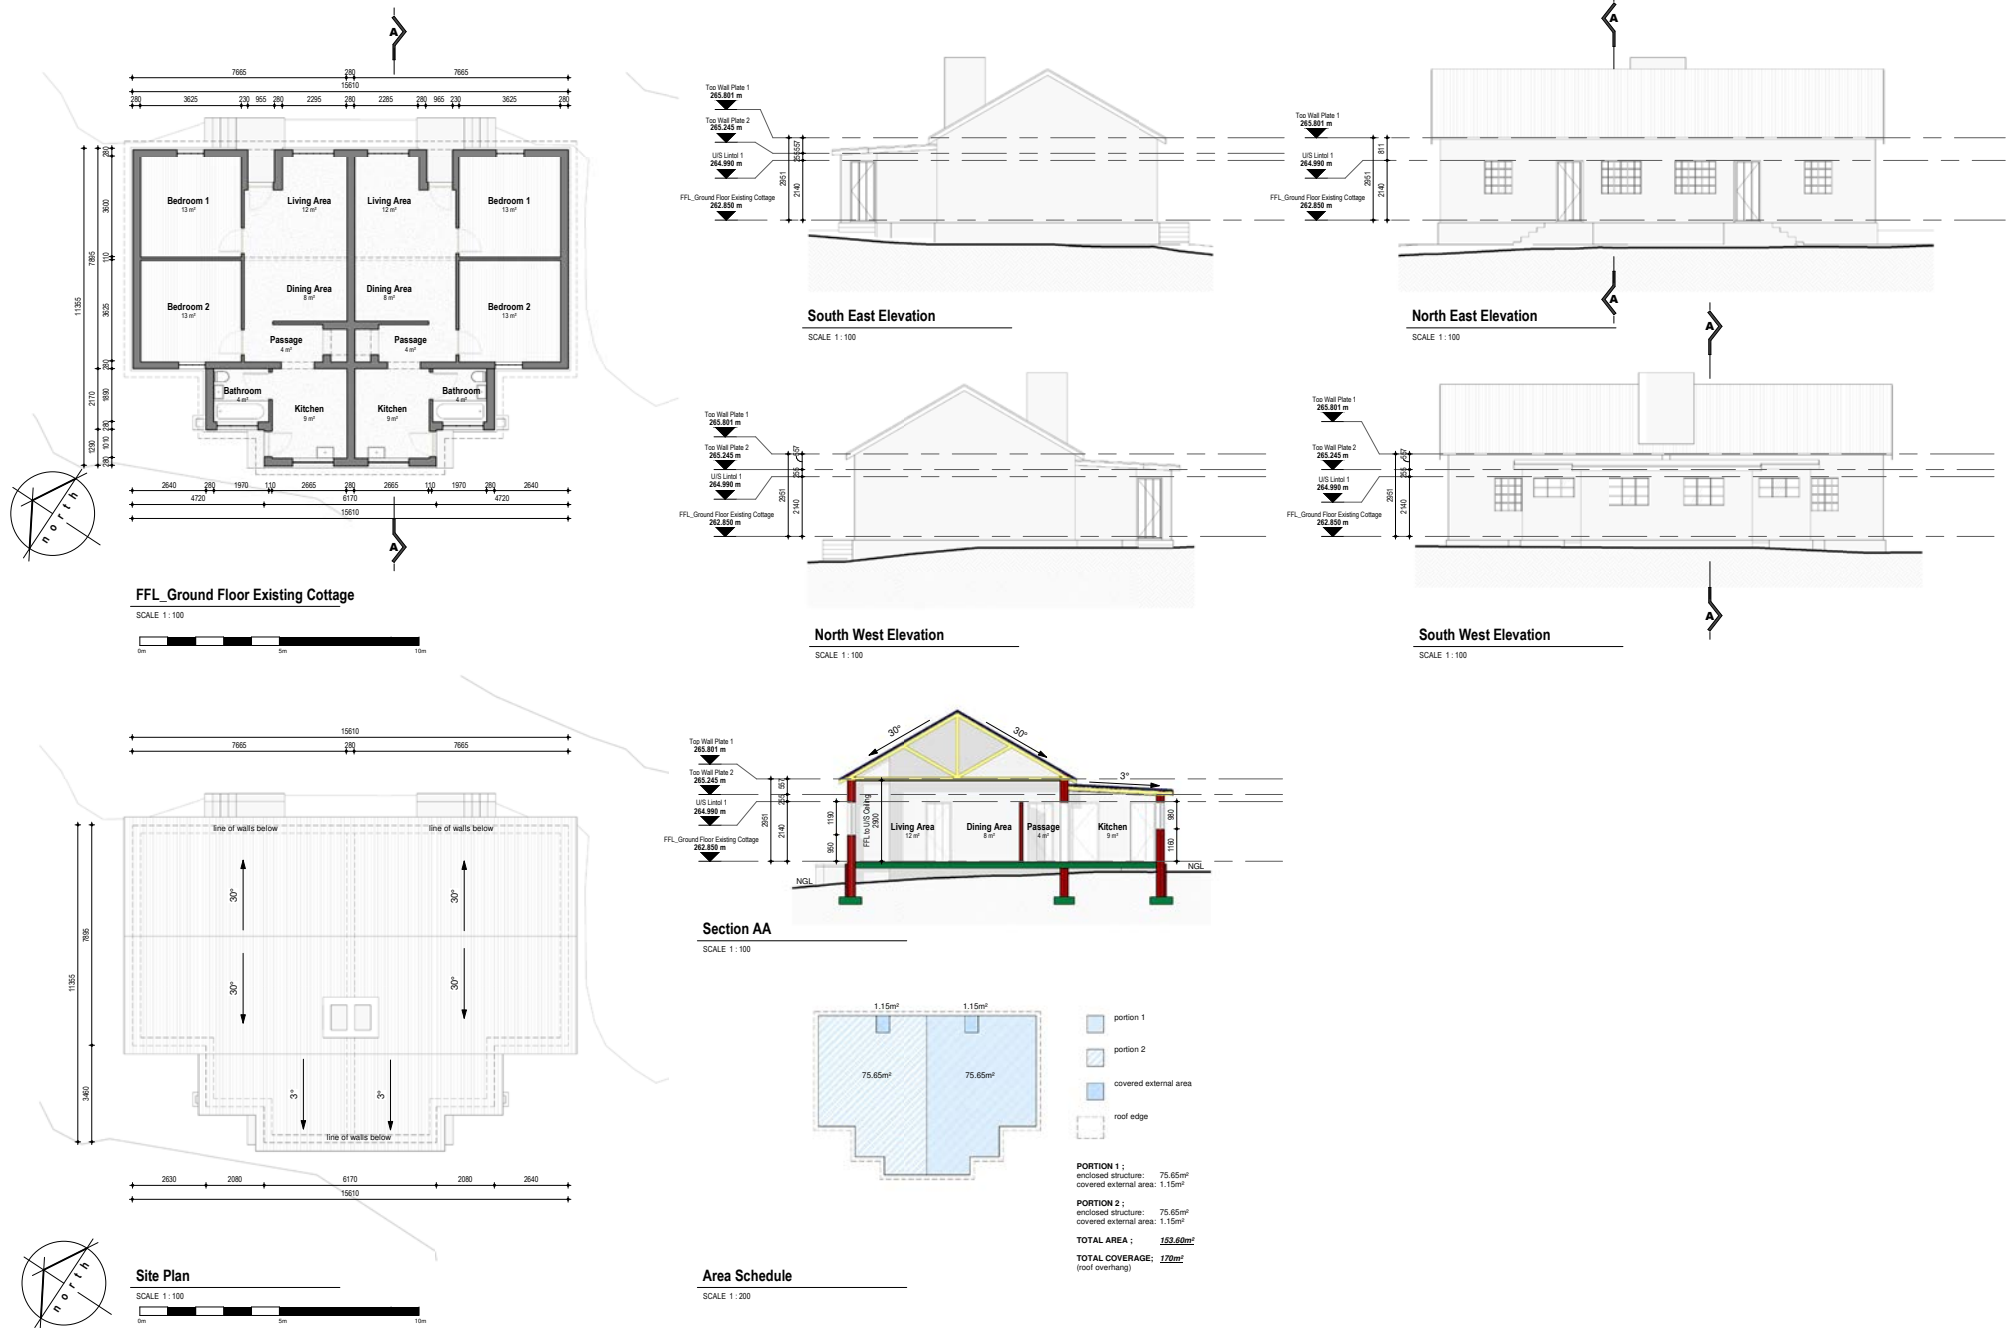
As built drawings, showing an example of a cottage (Source: Slee & Co Architects (PTY) Ltd.)
